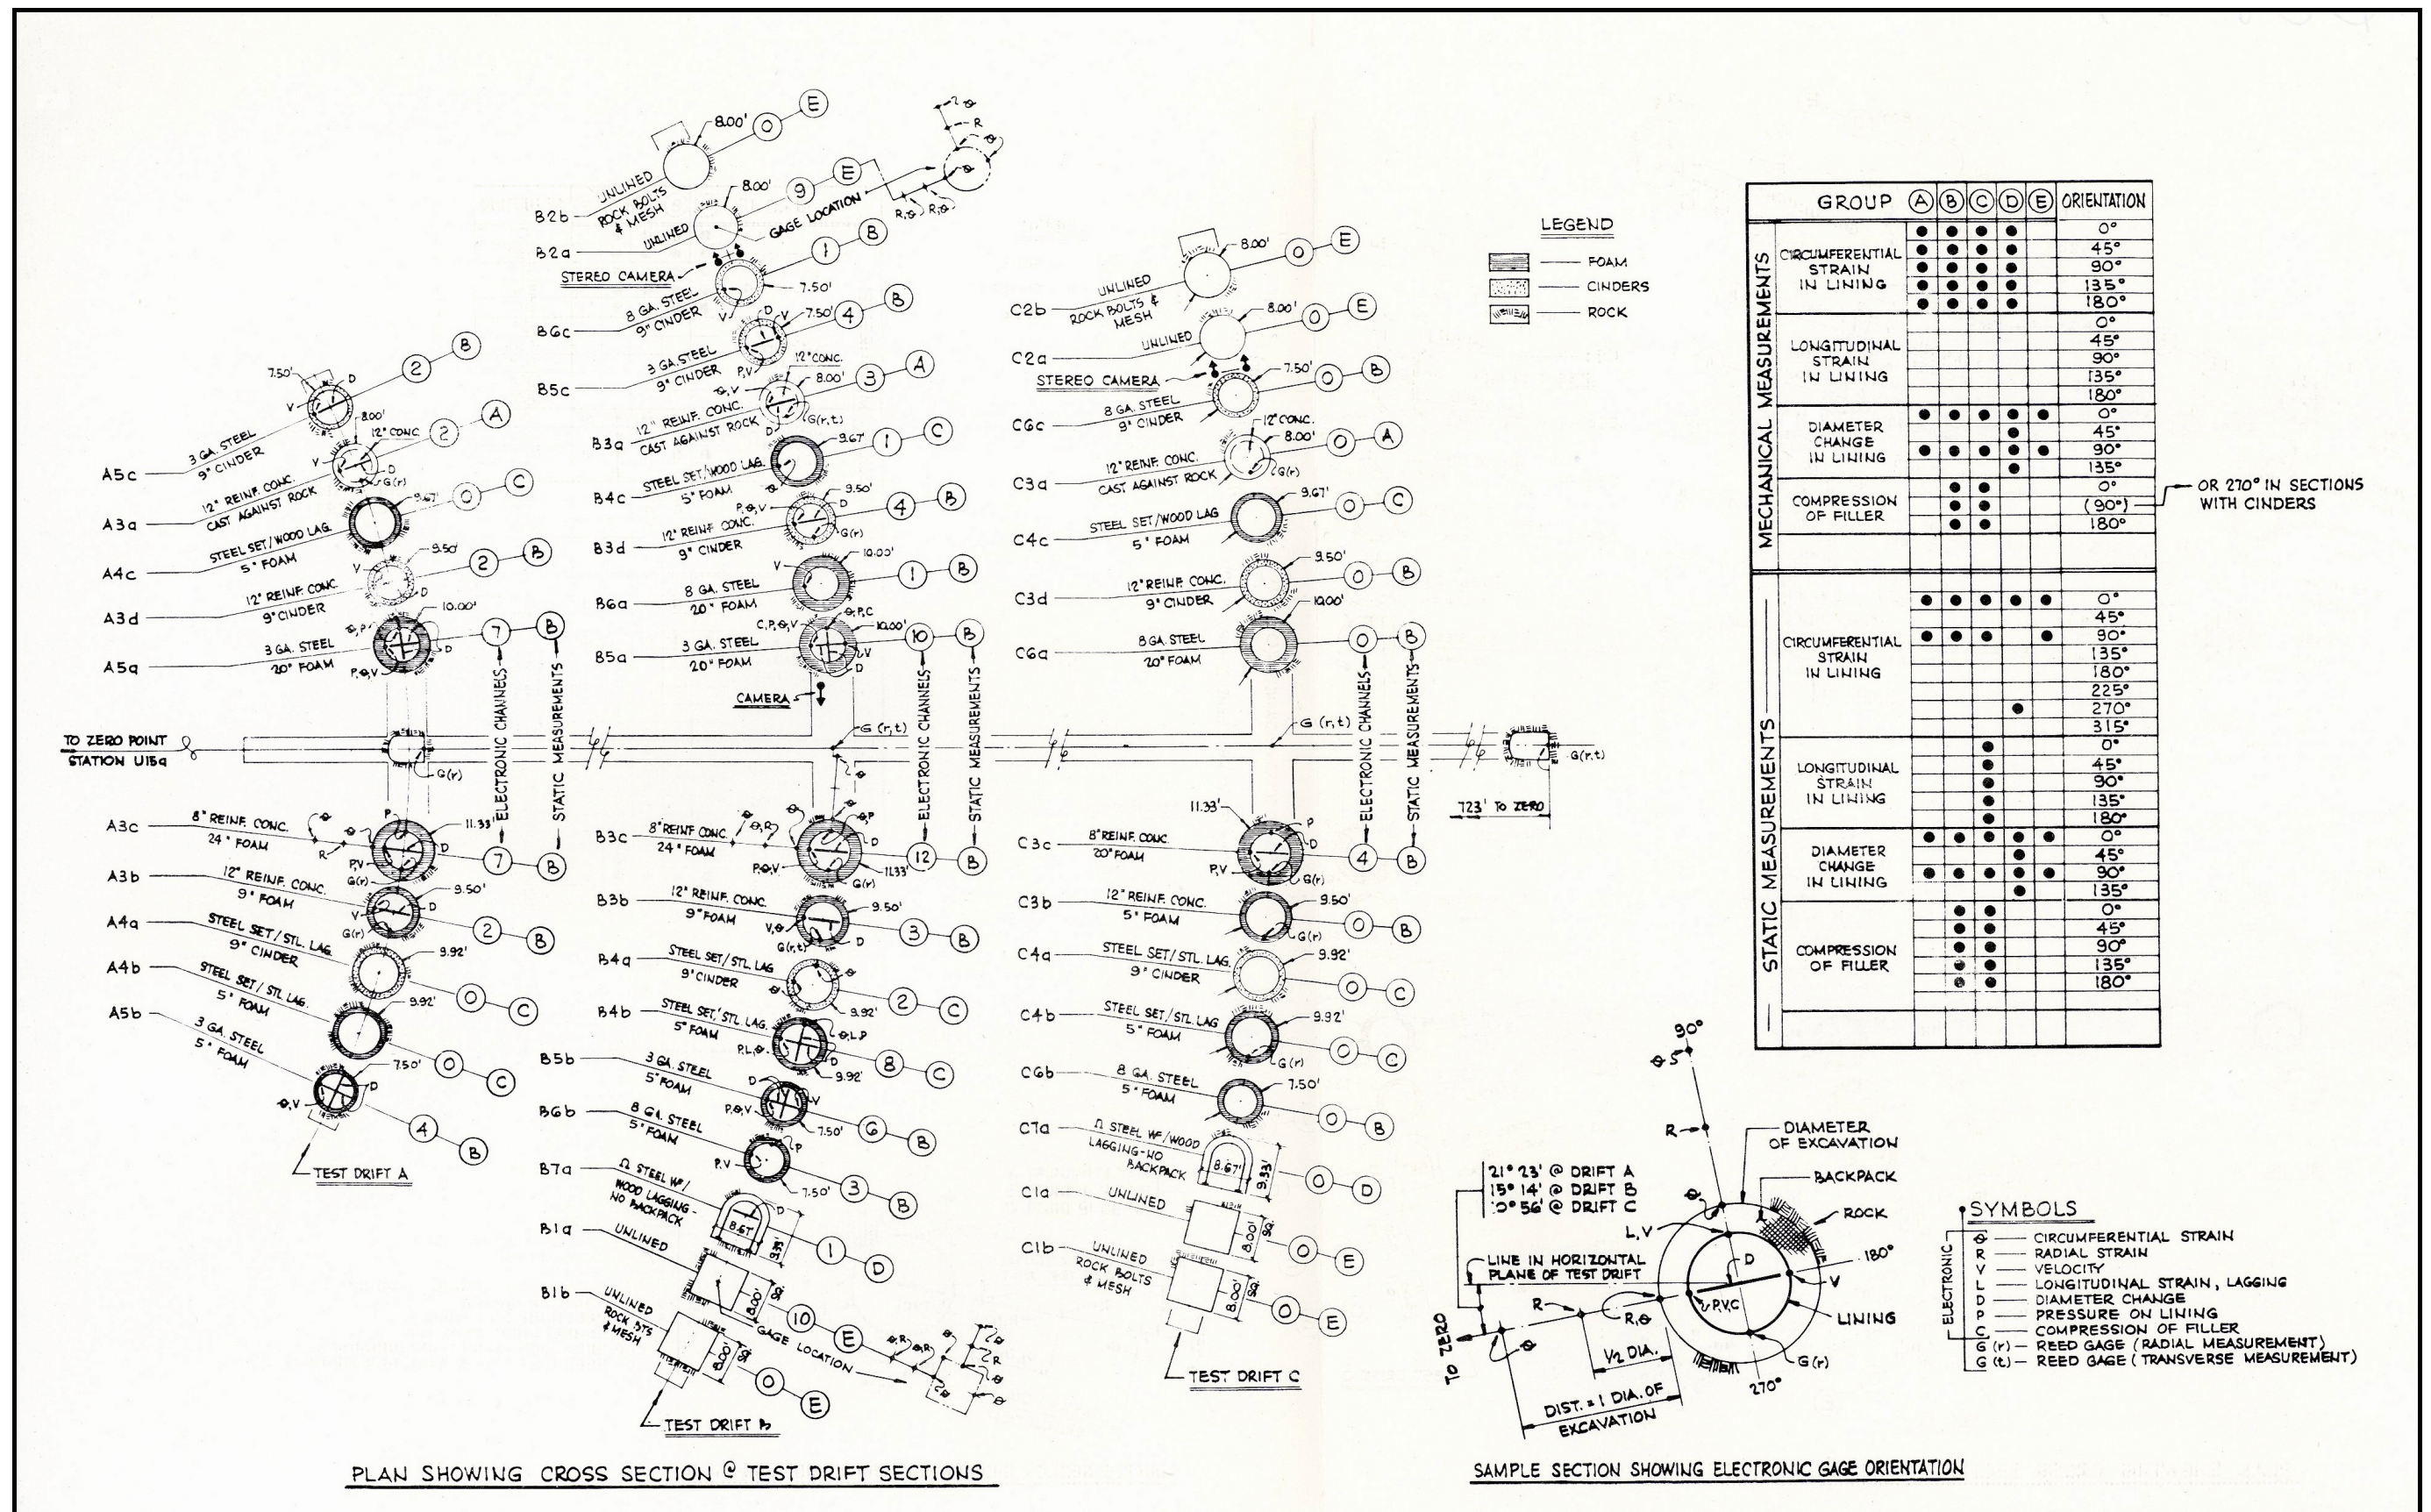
Instrumentation plan and cross section of the test drifts and tunnel liners for the Hard Hat nuclear test (Holmes et al. 1963:161-162).
